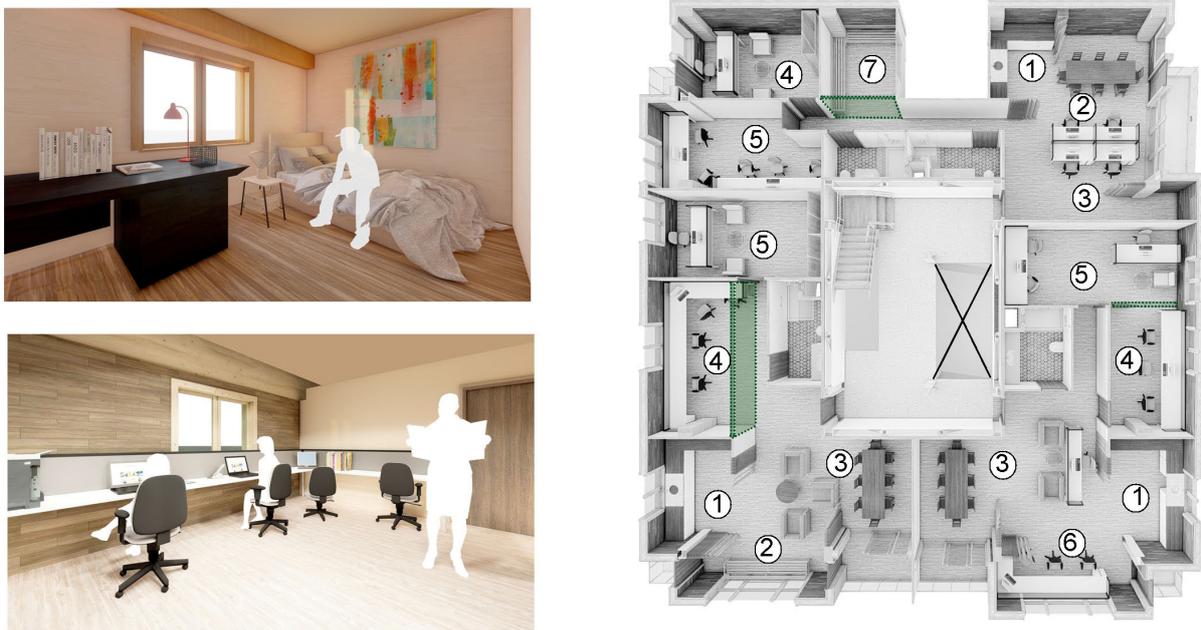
Transformation of a bedroom into an office space, and plan layout with indications of places suitable for functional changes; changes are given in Table 5.
